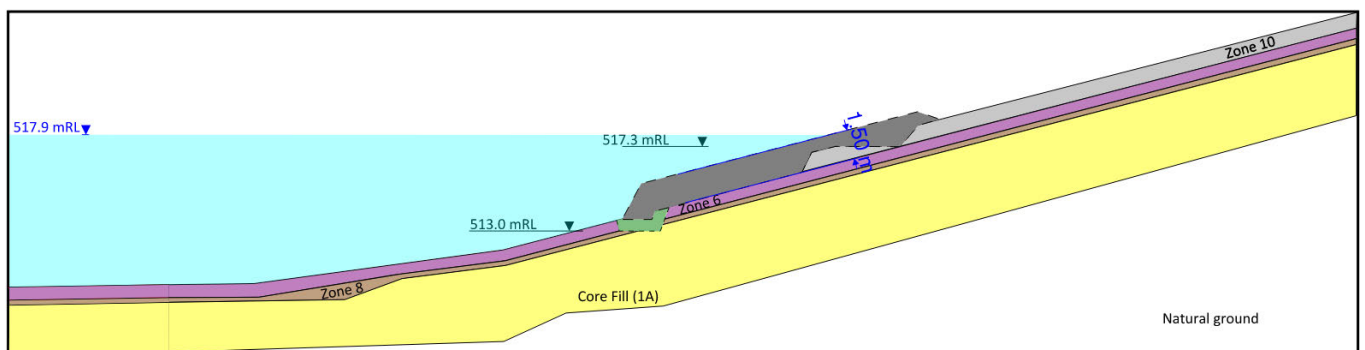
Schematic sketch – Tranche 1 – abutments – installation of rip-rap along upstream face and backfilling of construction bench – Not to Scale
